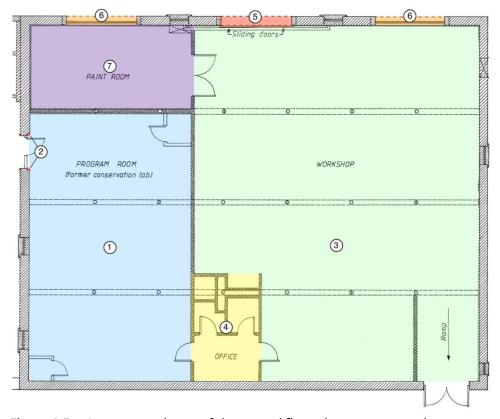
An annotated copy of the ground floor plan, rear or warehouse portion. North is to the top.
